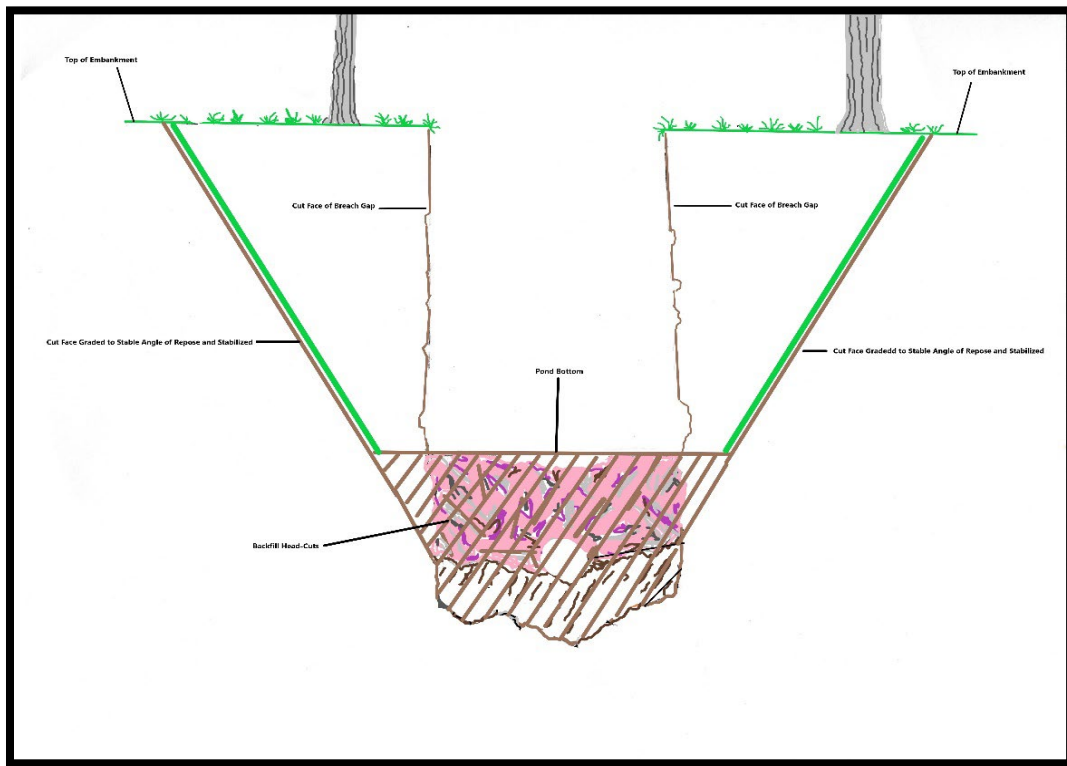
Cross-Section Concept for Stabilization Alternatives 1 and 2
